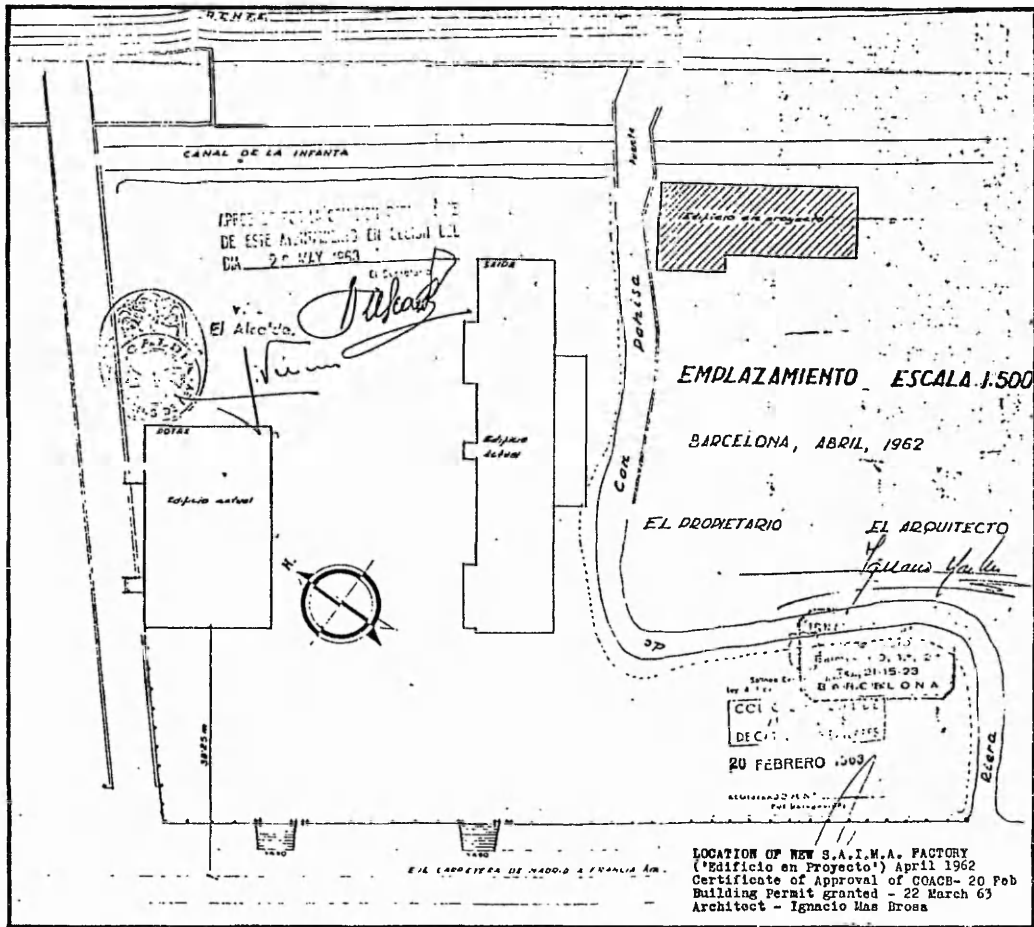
The SAIDA Building Permit Application : Plan of Location.
